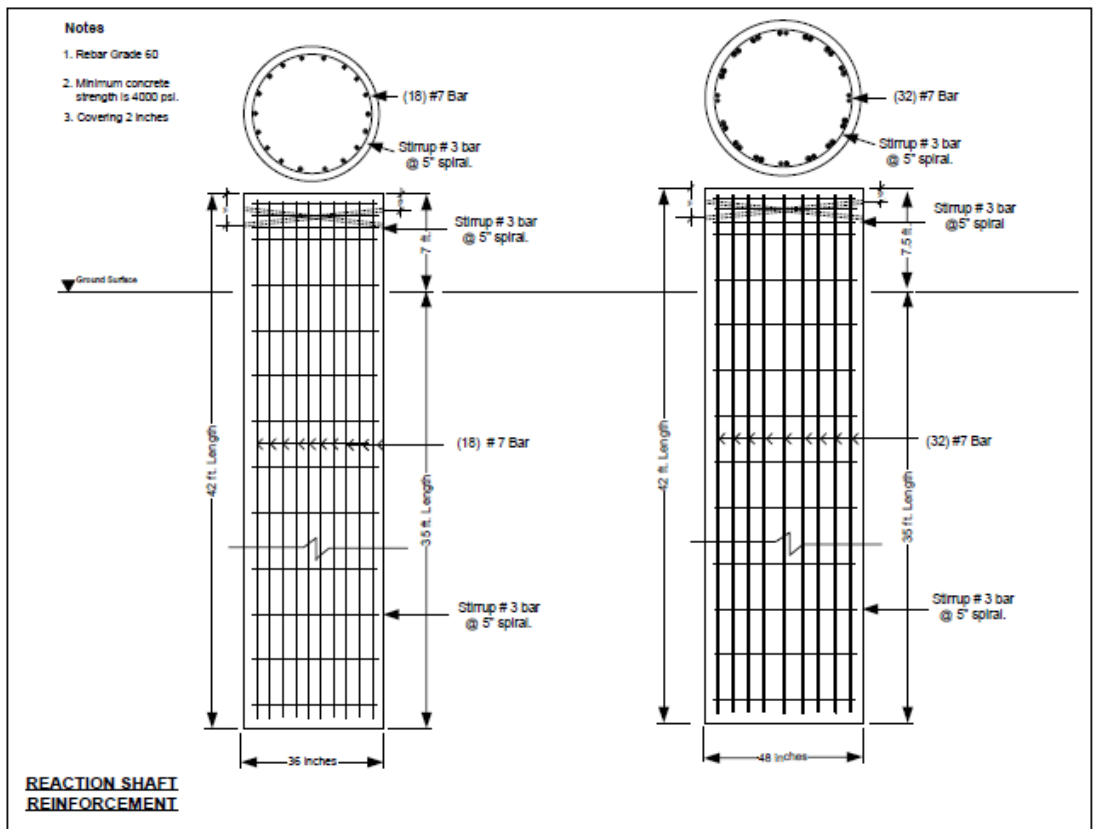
Steel Reinforcement Plan Sheet for the Reaction Shafts
